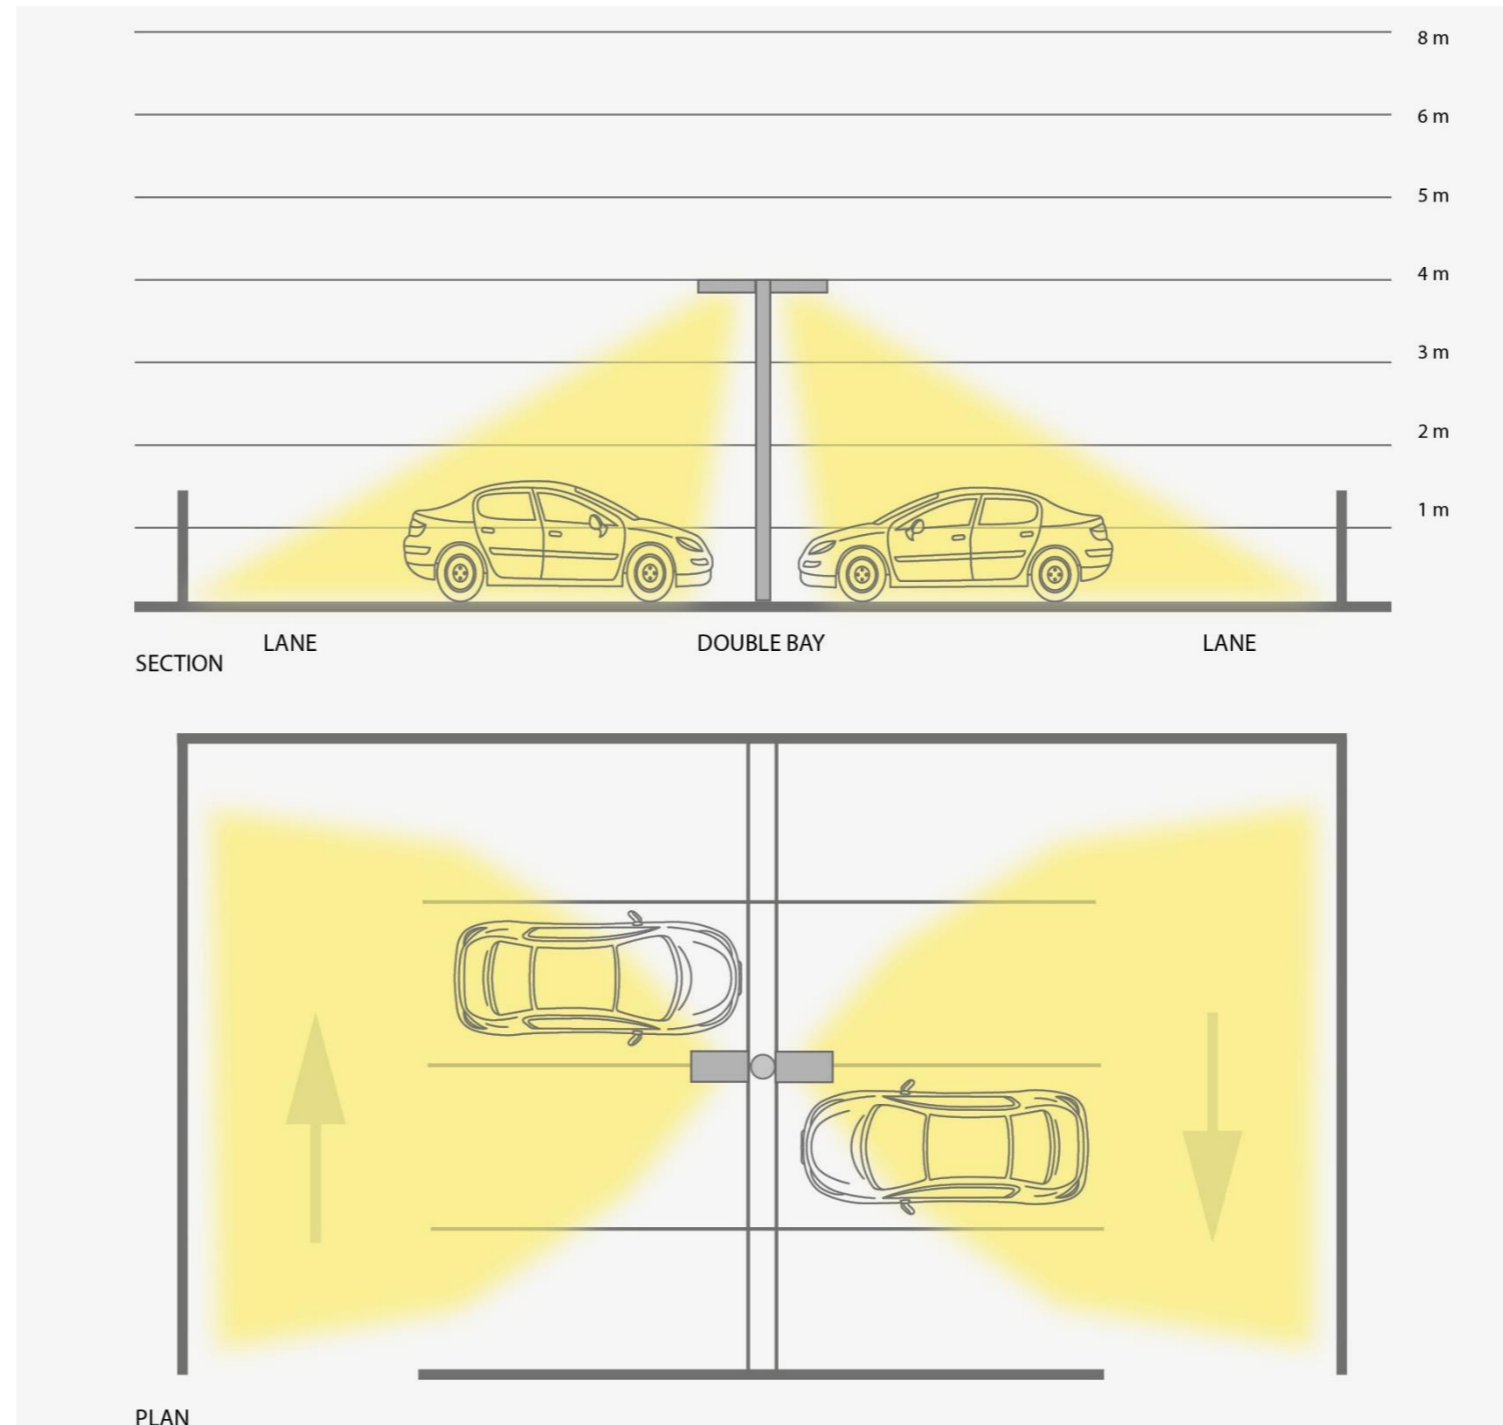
Double bay parking spaces lighting arrangement (open roof)
